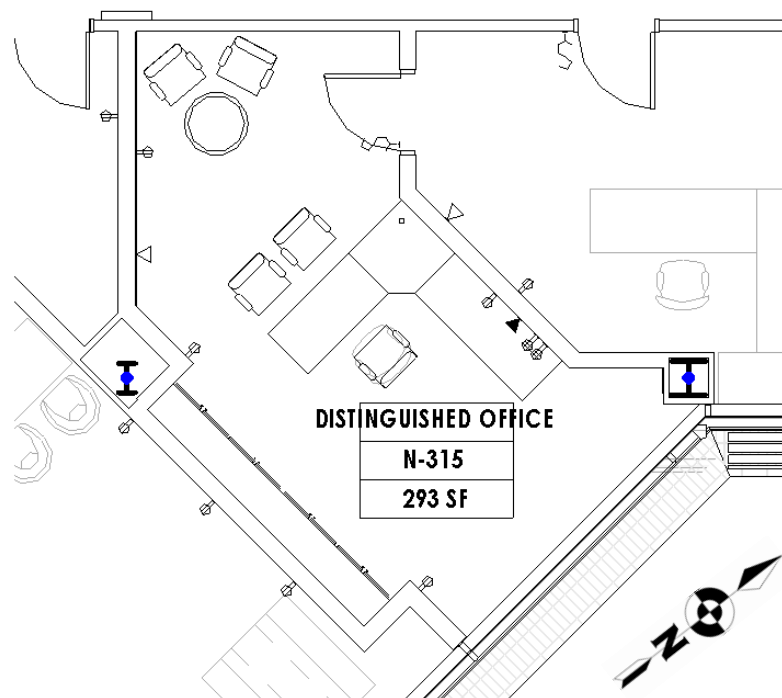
Distinguished Office Floor Plan, NTS, from KGB Maser Central Revit Model
